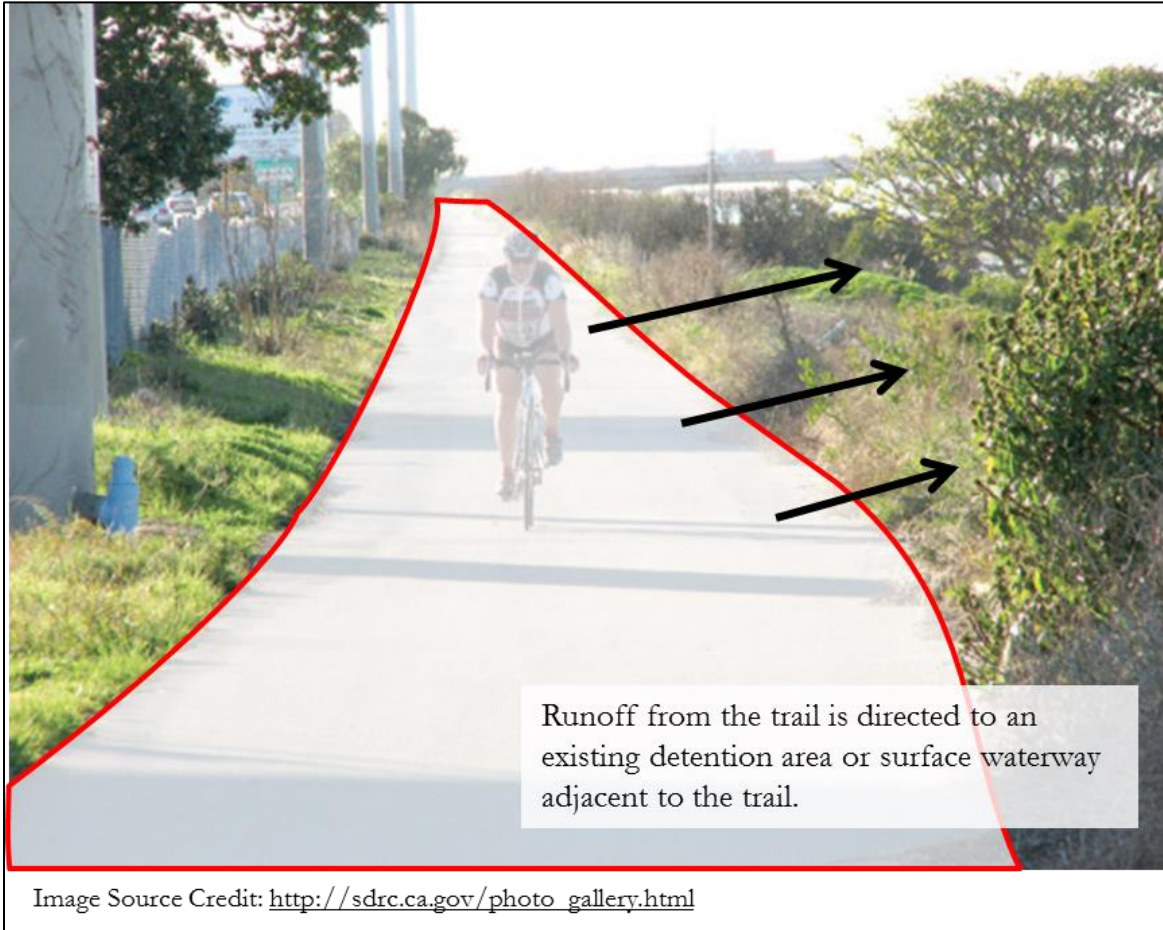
Schematic of a trail where the runoff does not comingle with street or road runoff
